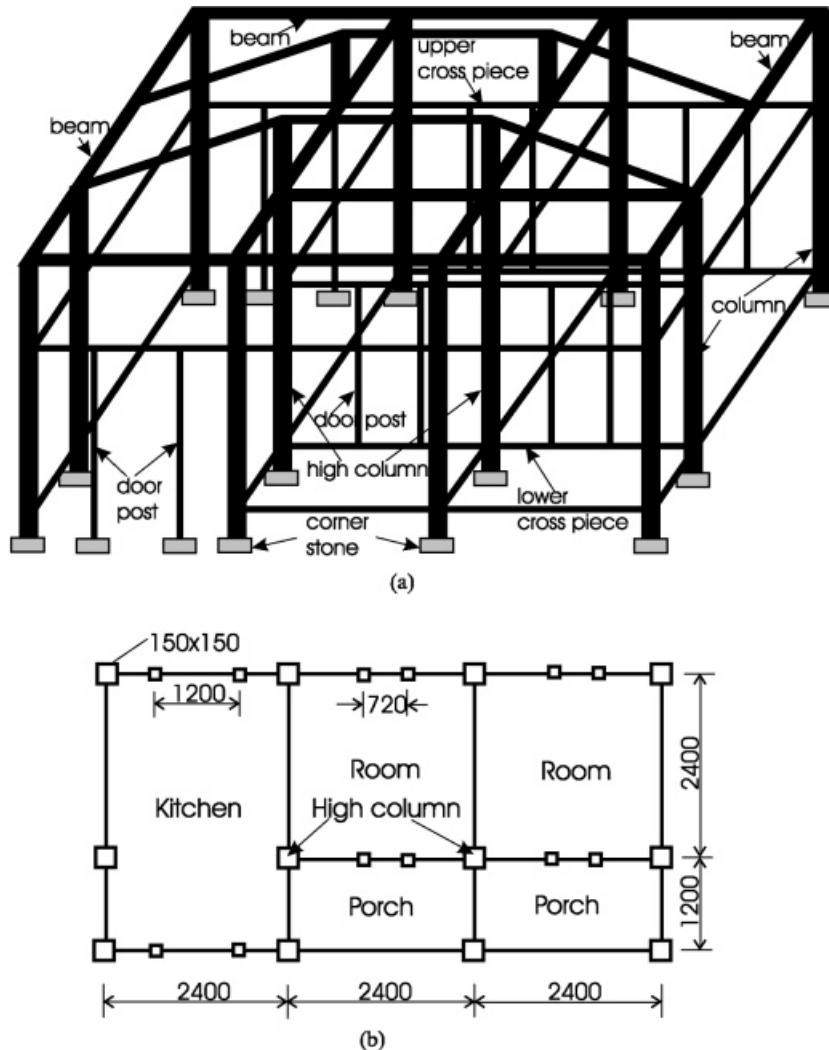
Structure of the prototype wooden house (unit: mm); (a) perspective view, (b) plan view
